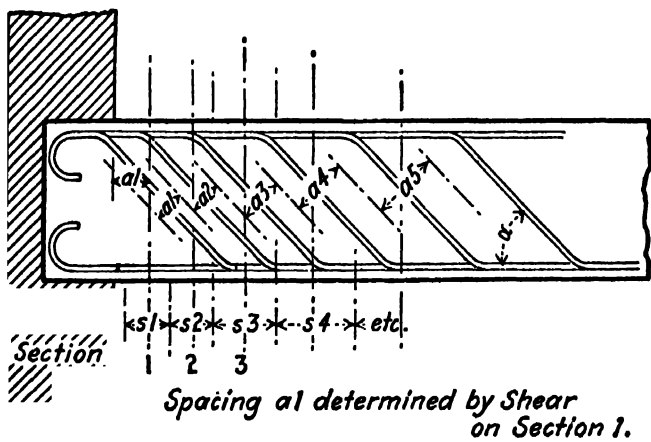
Typical beam with web reinforced by means of series of inclined bars.
